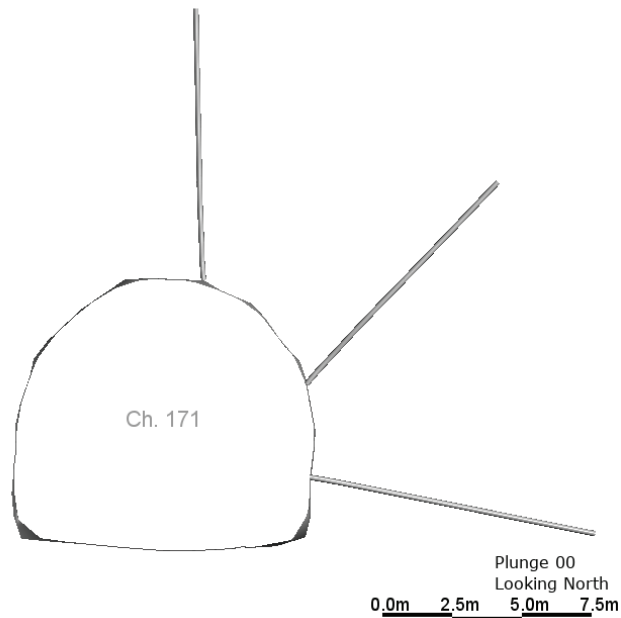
Positioning of test holes, example from the 3D model from Ch. 171 (Paper III).
